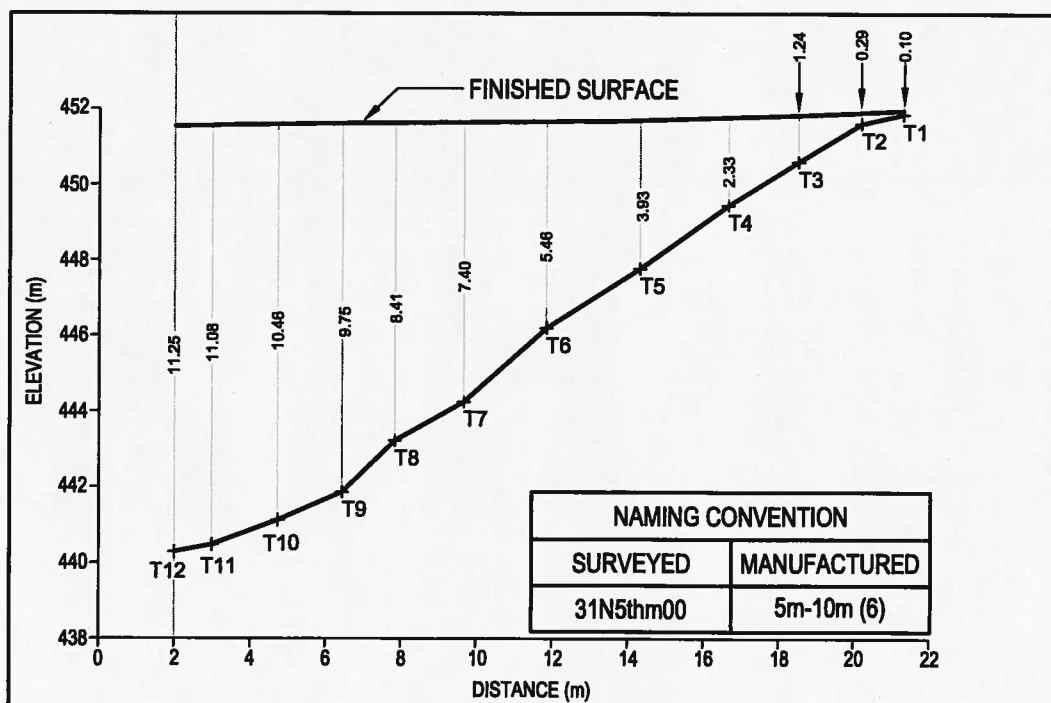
31N5thm00 (5m-10m (6)) - AS MANUFACTURED, PLAN, AND SECTION
